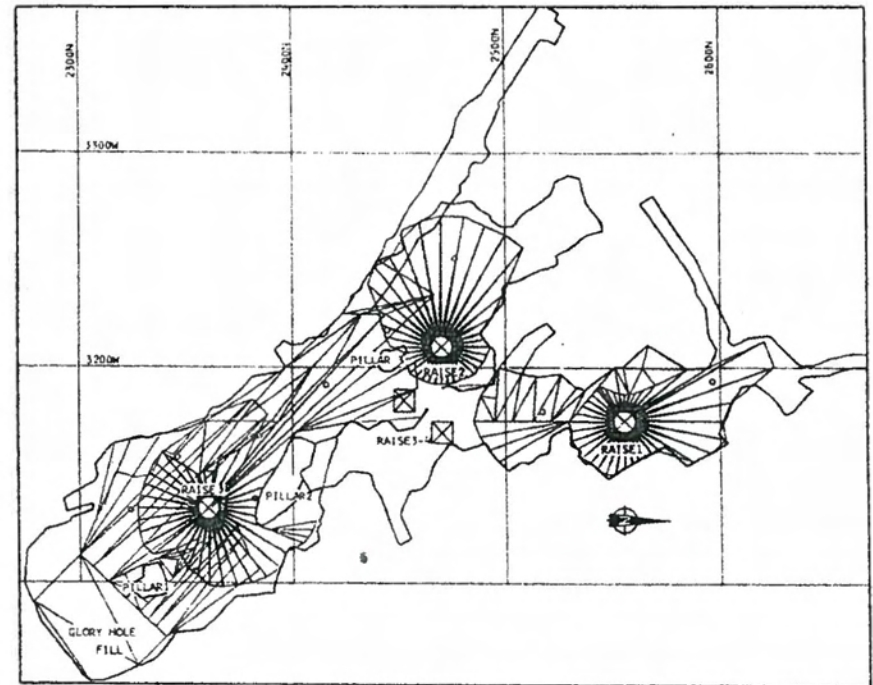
Plan of Sunnyside 3 Stope in South Central Pit showing distribution of raise fills. Generated from 3D computer model shown in Photos 1 and 2.
